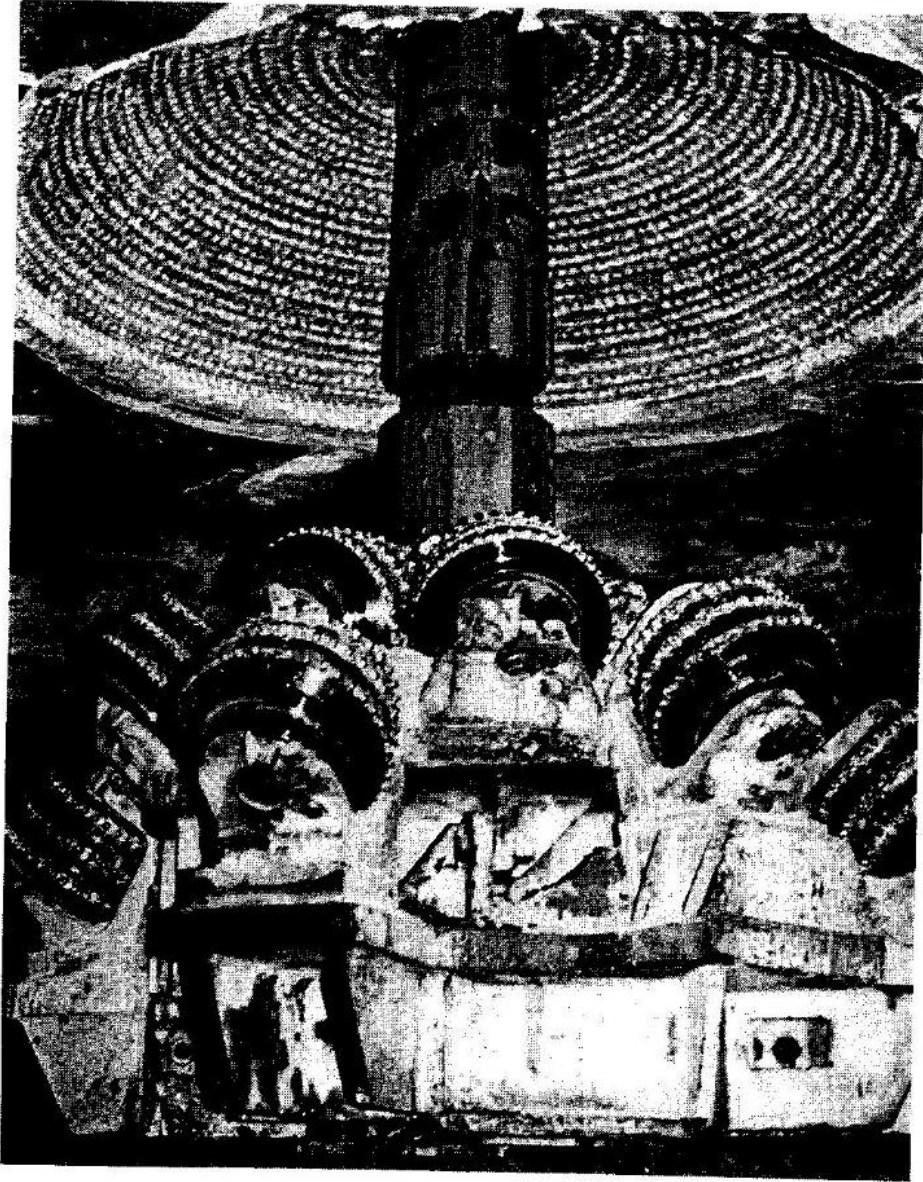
Top section of 16-ft (4.8-m) diameter reamer breaking through the surface after 1490 ft (453 m) of reaming.
